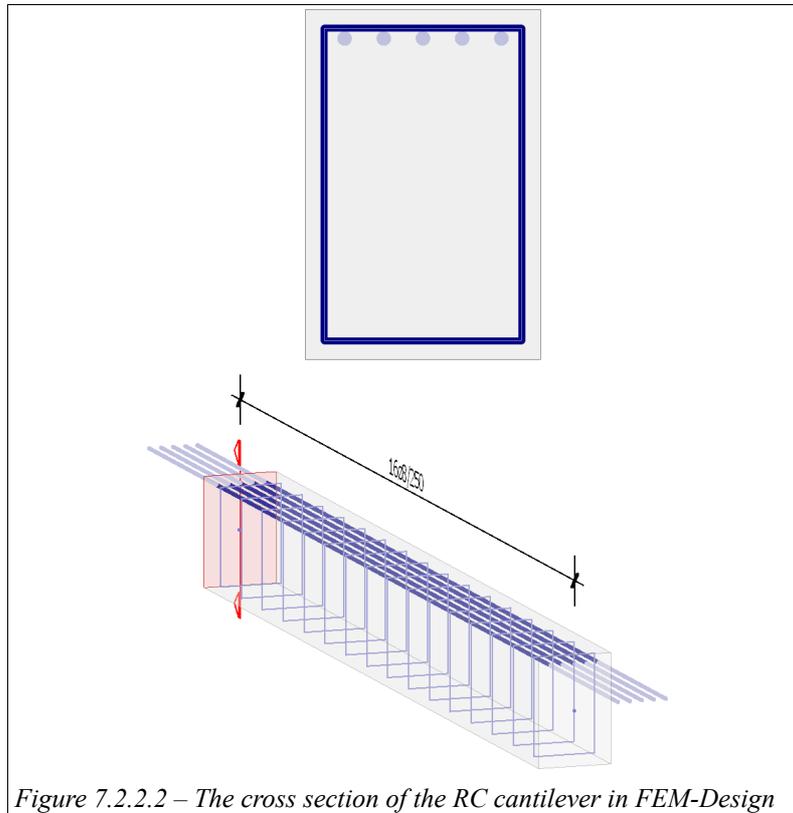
The cross section of the RC cantilever in FEM-Design
